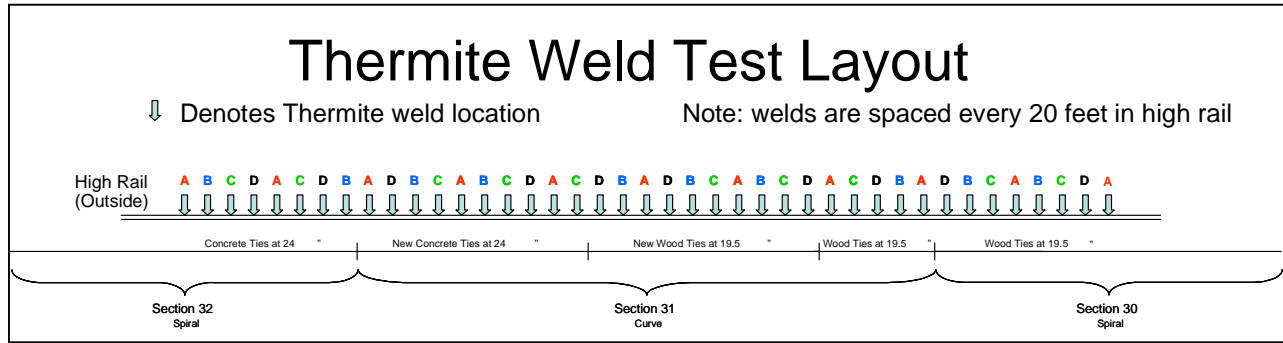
Layout plan for weld testing in FAST HTL Sections 30, 31, and 32. “A” designates Orgo 1-inch SKV welds (control), B, C, and D designate locations of the Orgo 1.5-inch SKV, Orgo HPW, and AG test welds, respectively.
